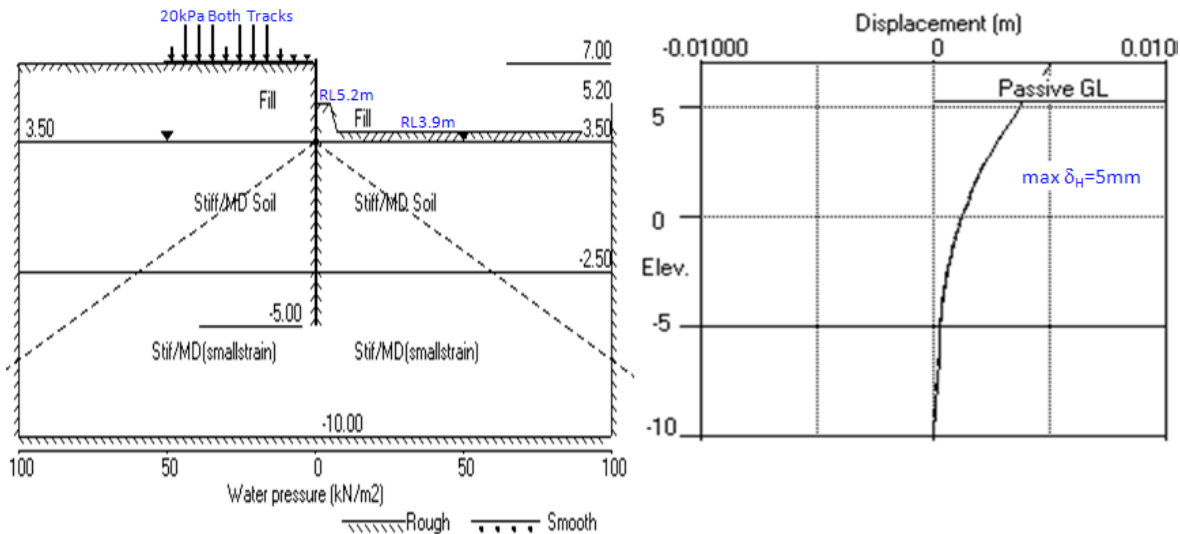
Simplified WALLAP-2D model, and deflection of the retaining wall (MC-increasing)
